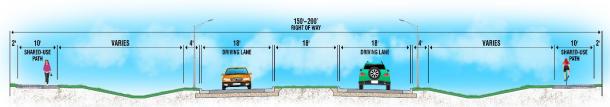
Roundabout Intersection Alternative Typical Section (Facing North)
